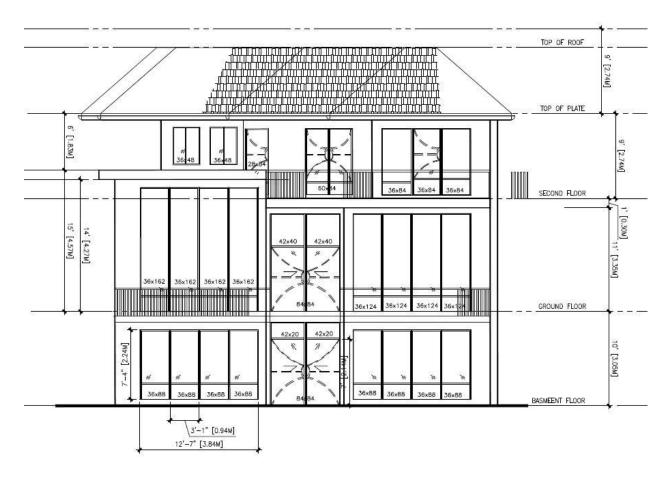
Rear Elevation of the development proposed for 347 Queen Street South. (Drawing by client, Jan. 2021.)
